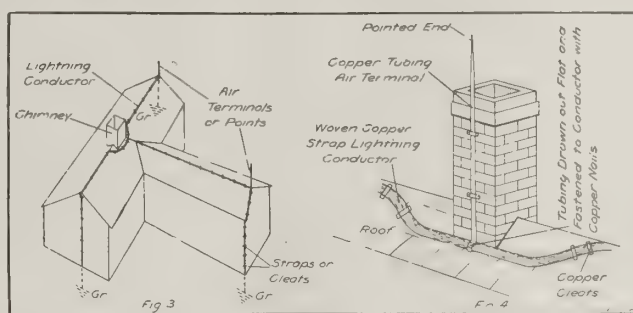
TYPICAL ARRANGEMENT OF AIR TERMINALS AND LIGHTNING CONDUCTORS ON A BUILDING. FIG. 4. ARRANGEMENT OF AIR TERMINAL AT CHIMNEY OF AN ORDINARY BUILDING.
